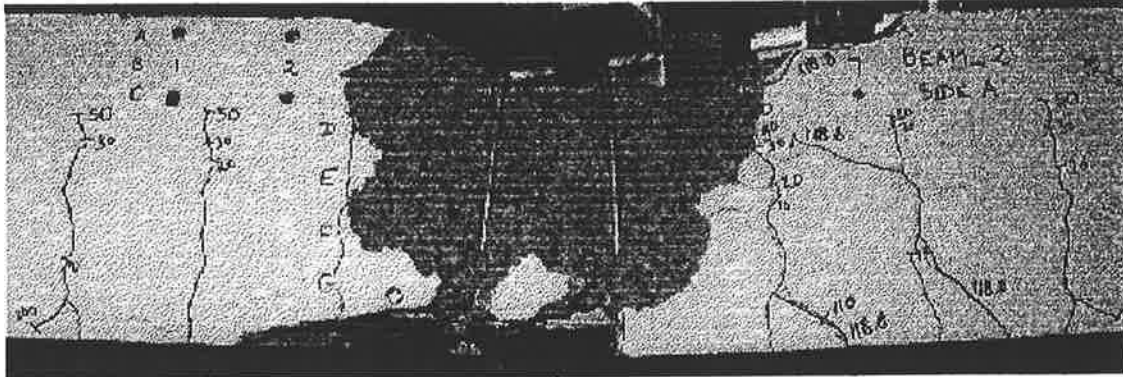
Spalled concrete removed from beam 2.
